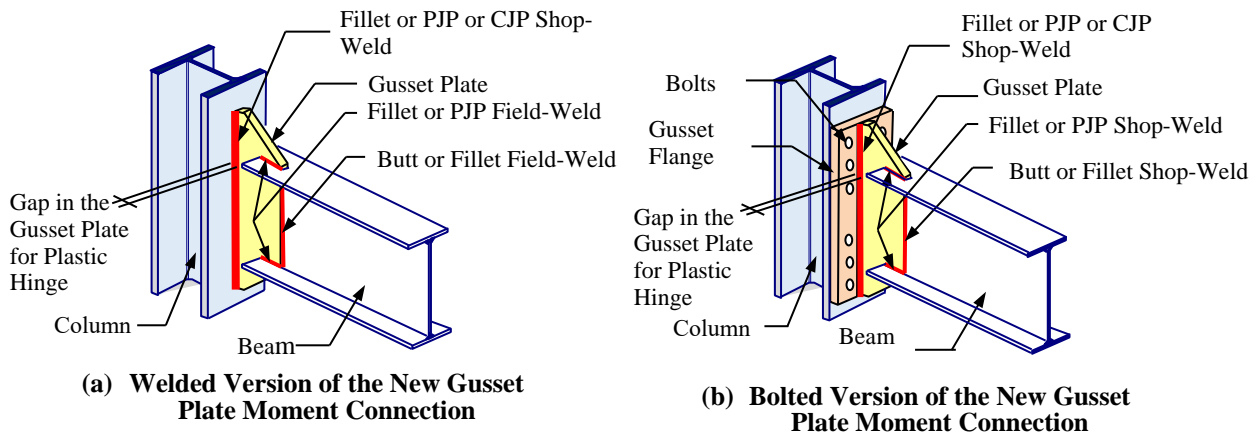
(a) Welded, and (b) bolted versions of the new Gusset Plate Moment Connection
